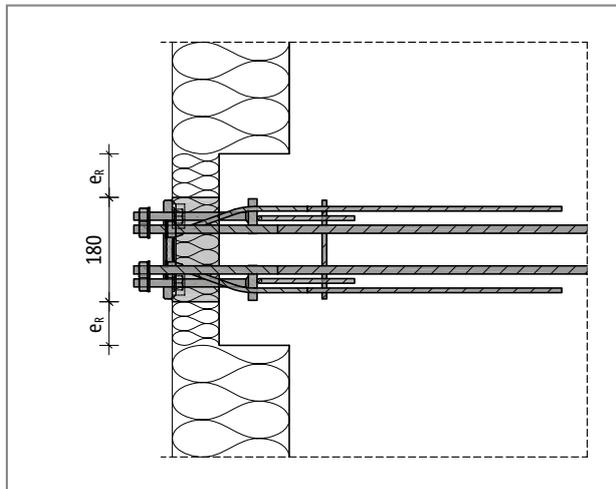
Schöck Isokorb® T type SK: Edge distances
